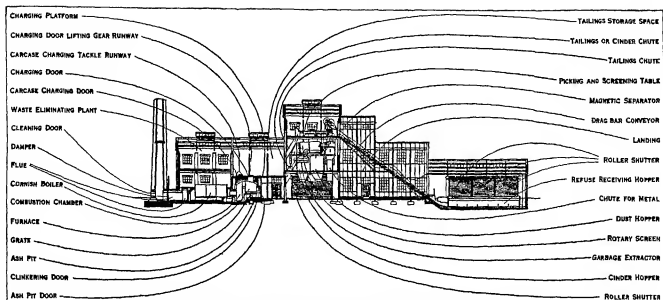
LONGITUDINAL SECTION OF REFUSE DISPOSAL PLANT OF THE NEW DESTRUCTOR COMPANY WITH REFUSE SCREENING PLANT
